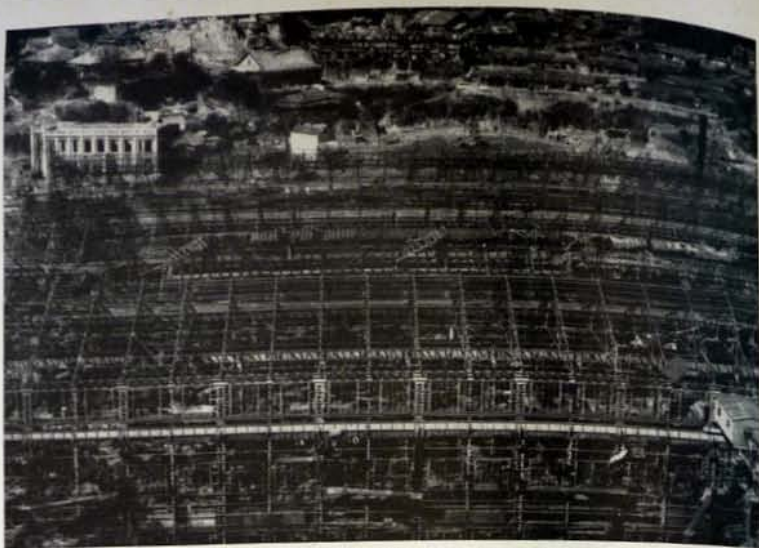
Group 52. Aerial view looking northwest across stripped roof of Building 15.
